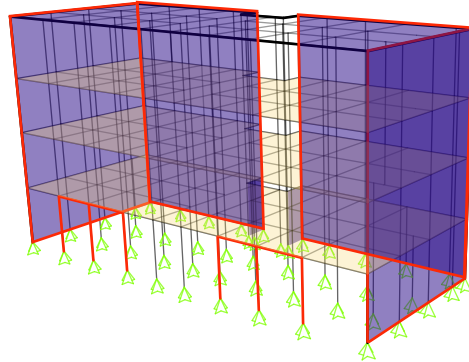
Retrofit 13: Addition of Moment Frame at Façade of Garage Oriented Strand Board on Exterior Walls.
